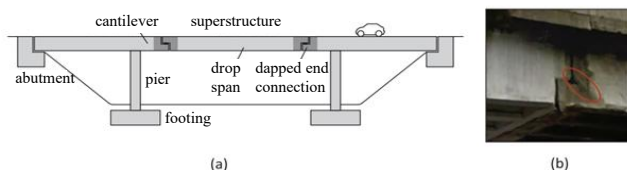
Dapped-end connections in existing bridges: (a) a typical bridge with dapped-end connections; (b) deteriorated connection in Lecco bridge, Italy, prior to its collapse (Google Street view, 2017)
